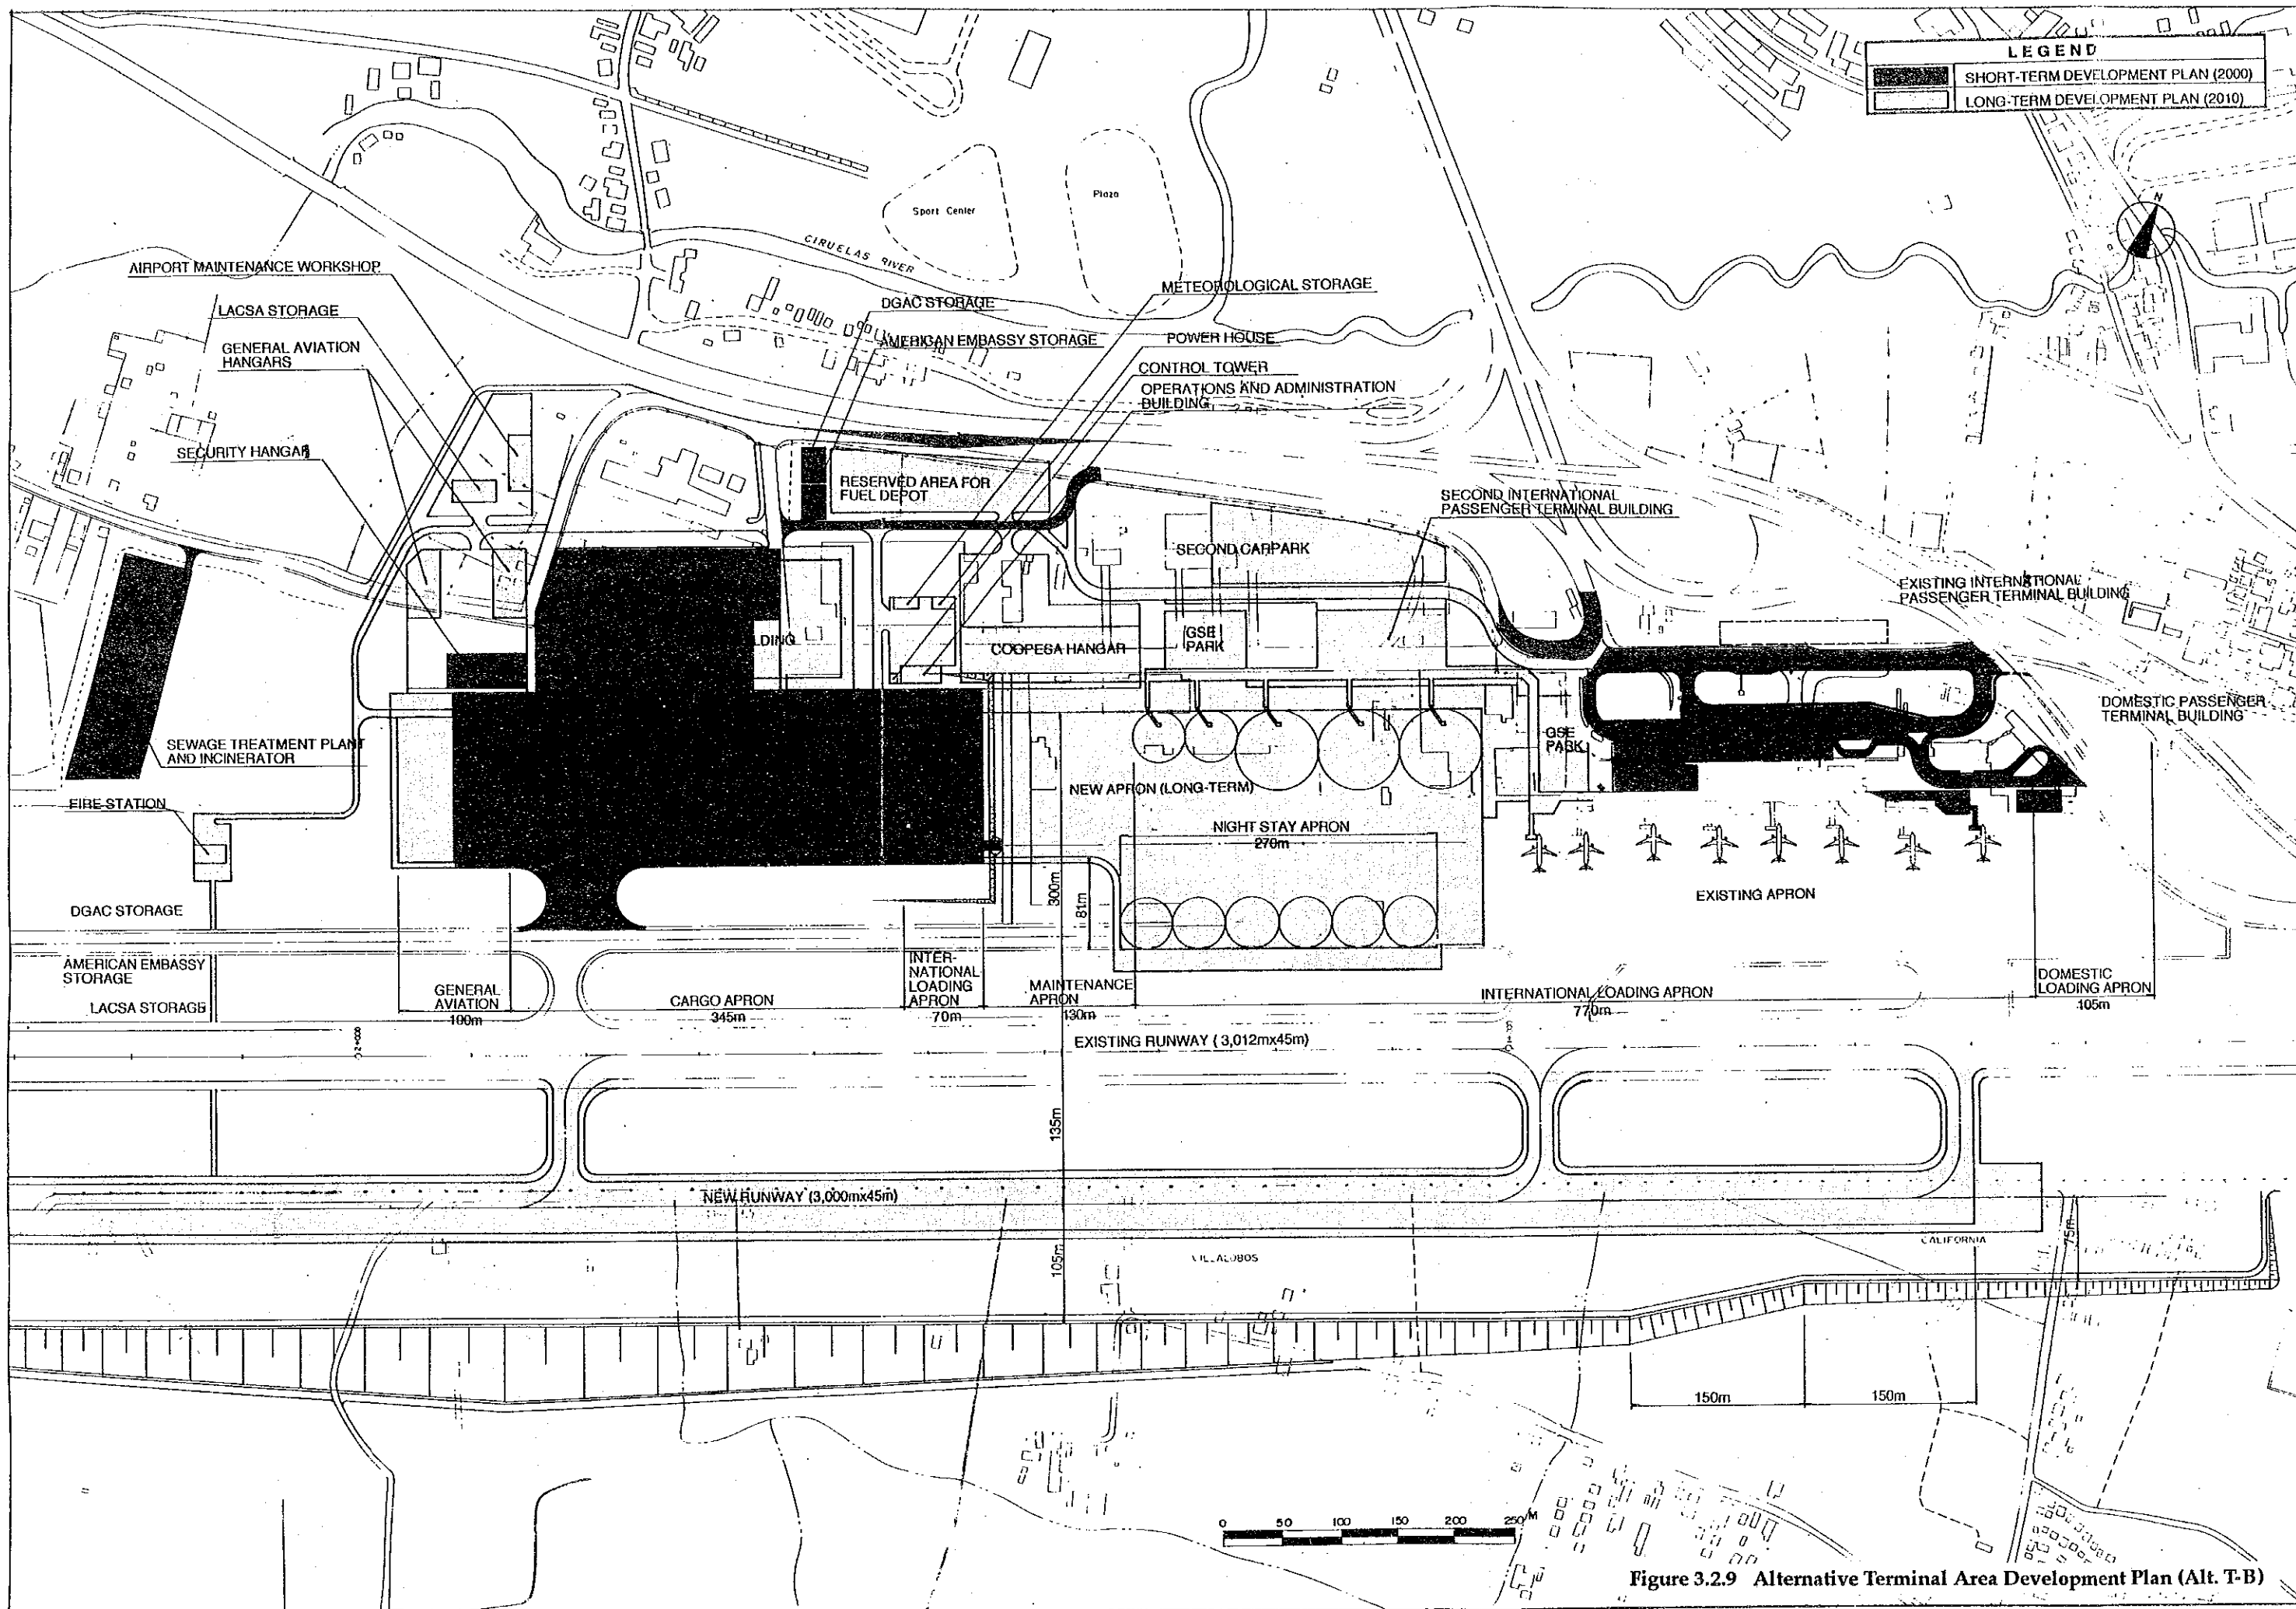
Alternative Terminal Area Development Plan (Alt. T-B)
